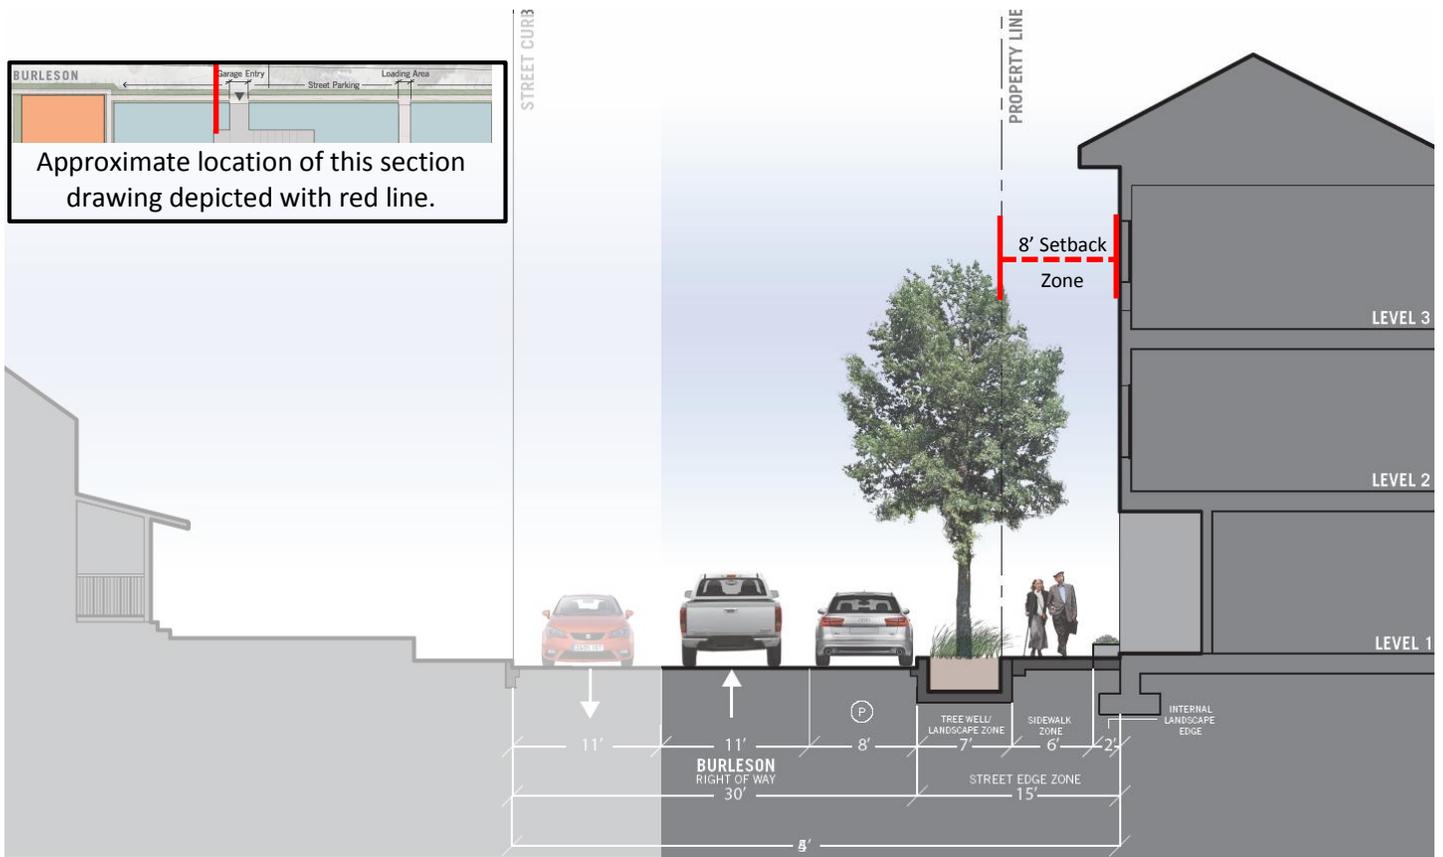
Burleson Street streetscape design concept adjacent to multifamily building, where building expression is closer to the right-of-way.
